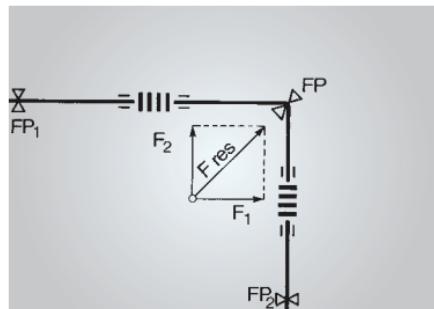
Bent system with axial expansion joints and elbow anchor
